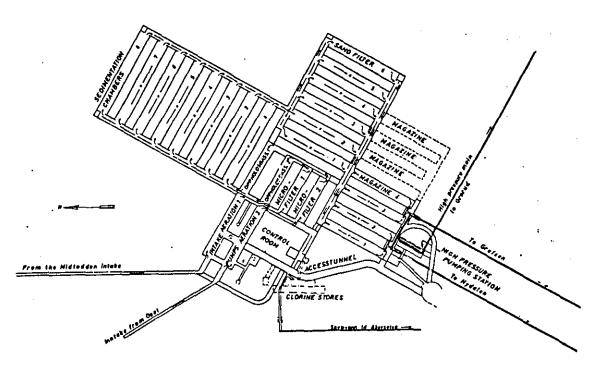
Lay-out of the Oset Water Treatment and Pumping Plant.
